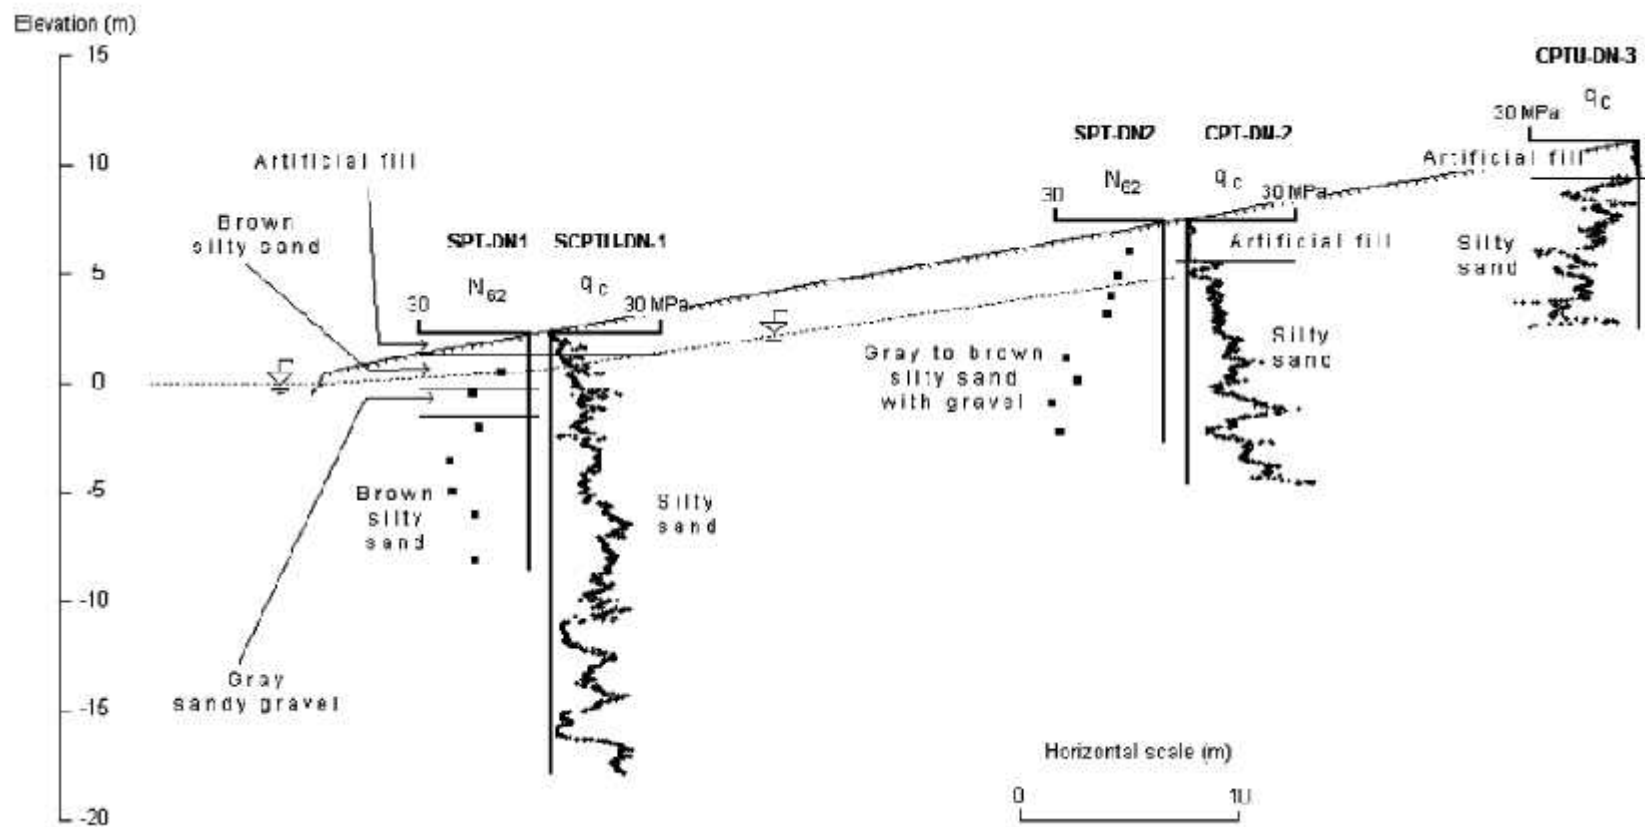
Cross-section I-I (Figure A.157) through Degirmendere slope (Cetin et al. 2004)
